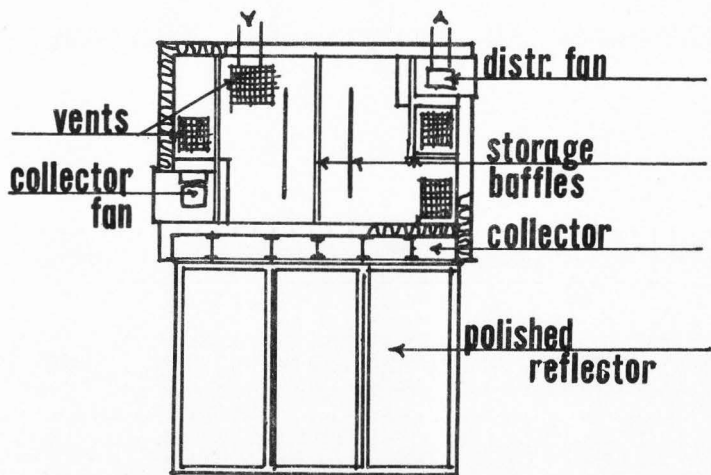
Floor plan of ISC backyard solar furnace (Keyes, 1975).
